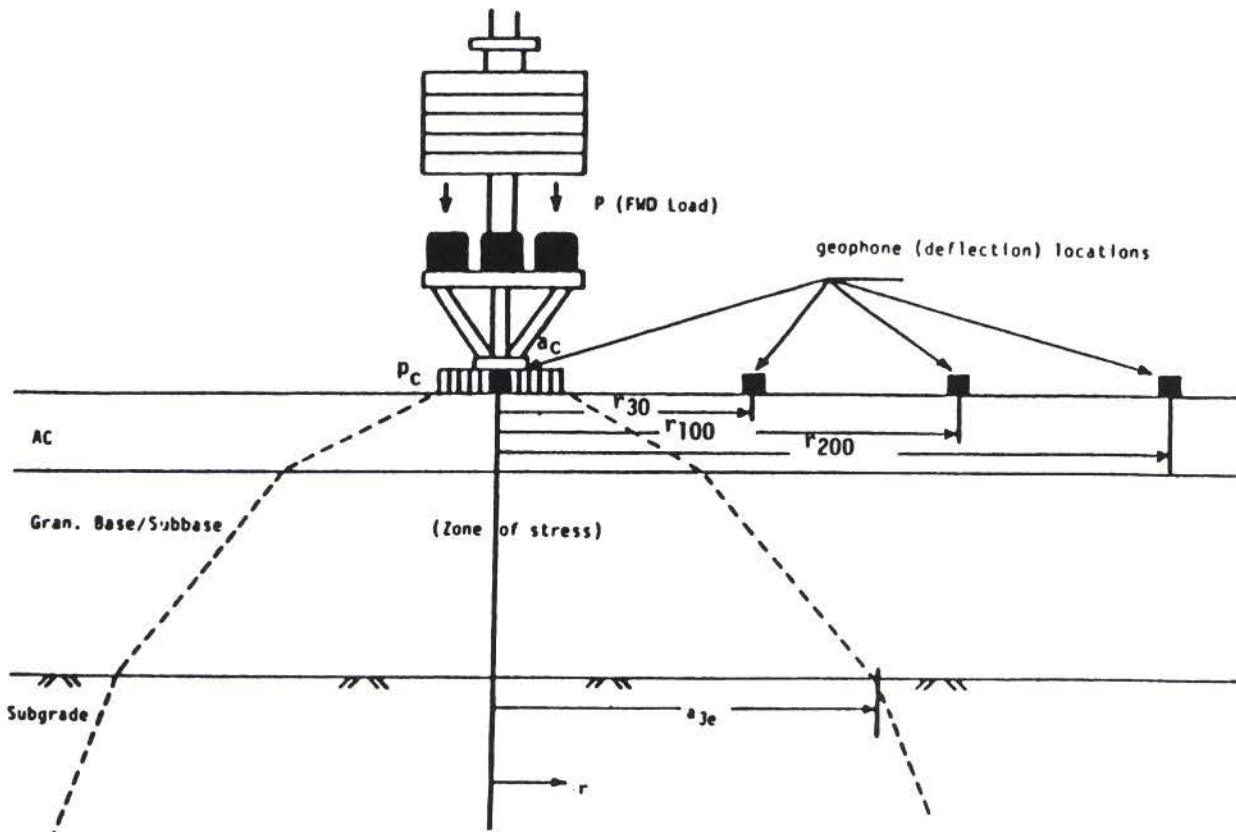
Determination of pavement deflections due only to subgrade modulus (5).
